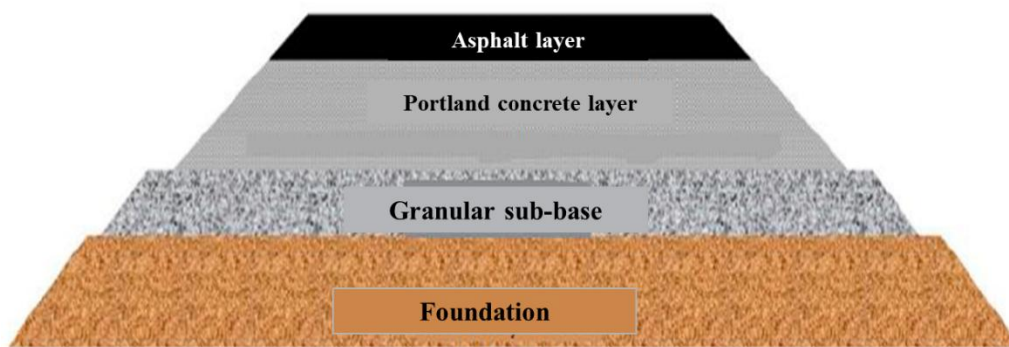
Cross-section of a semi-rigid pavements. (Plati 2019)
